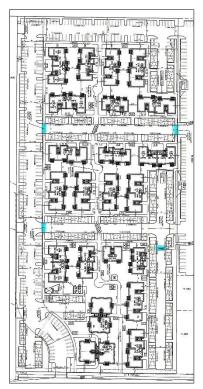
(blue indicates extension of walkway poured concrete)
